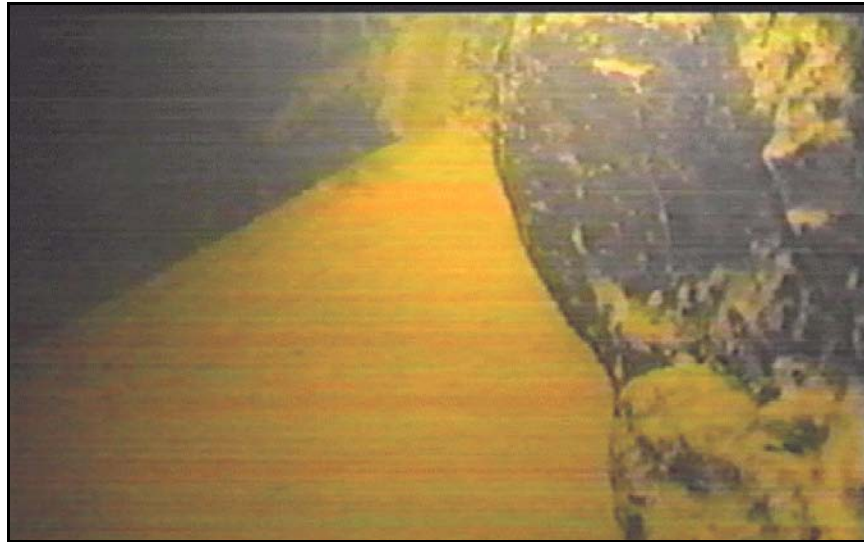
The camera-crawler encountered fine sandy materials that appeared to be entering the conduit through a defect in the sidewall. This view is looking upstream at the right side wall. The conduit had not been operated since the fall of 2003. These materials had collected within the conduit over the last 7 months.
